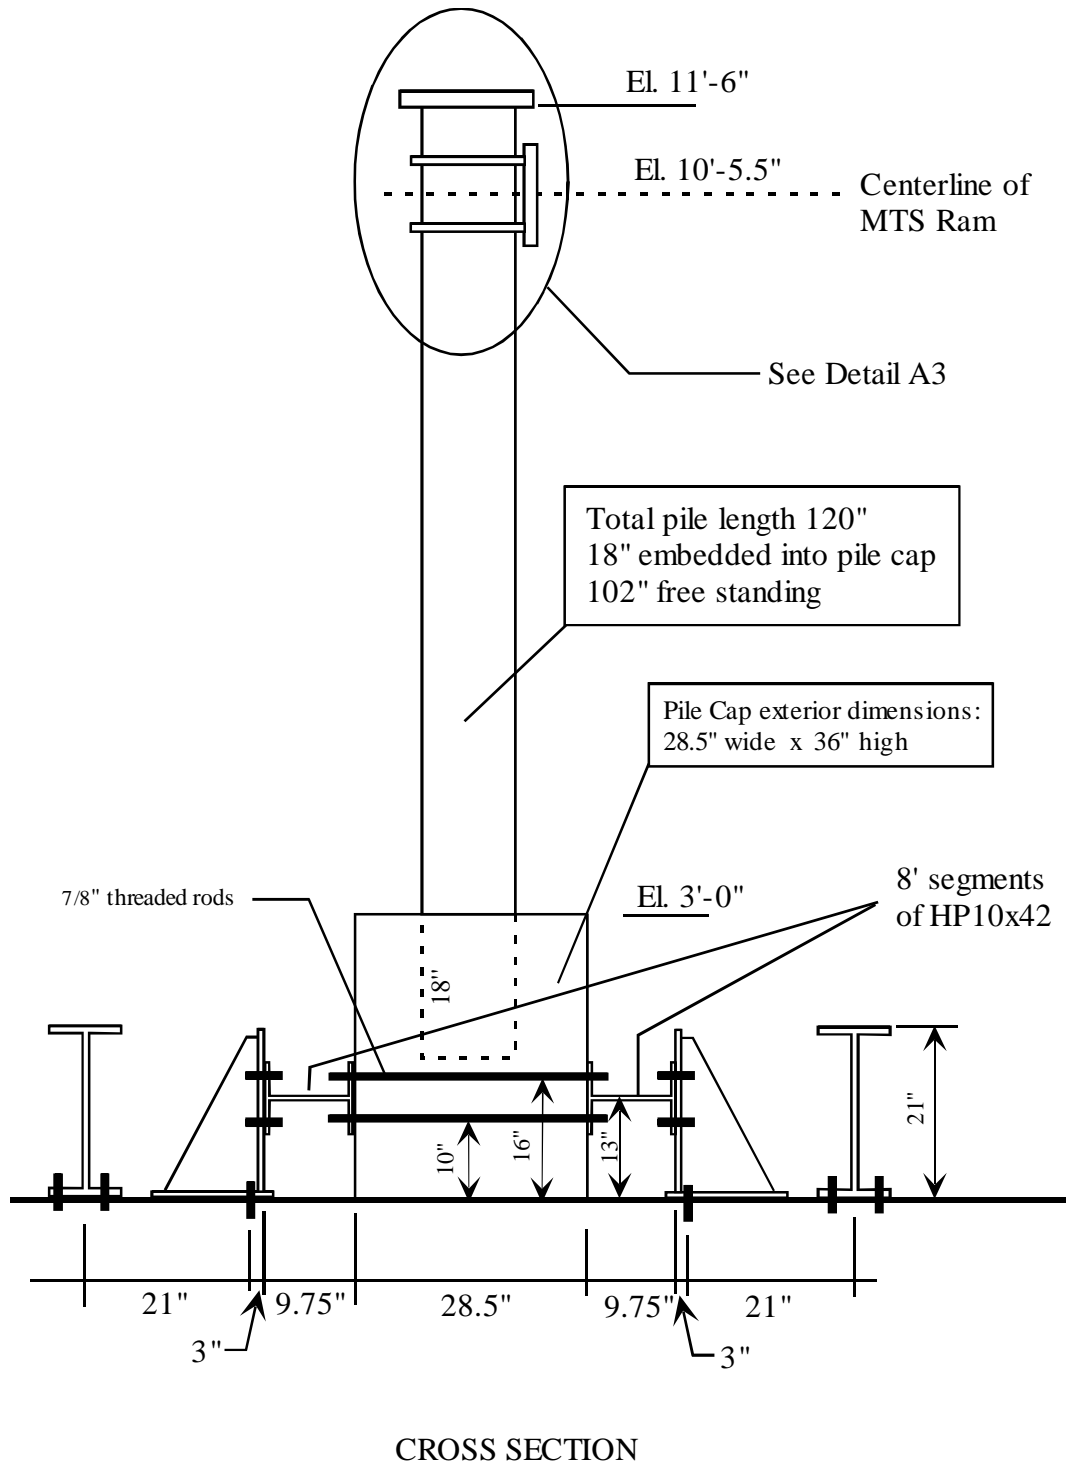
(Continued). Drawings of pre-stressed concrete pile
